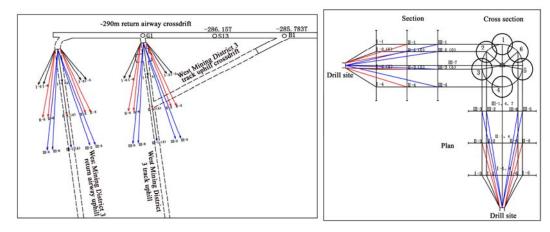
Layout plan of drill holes for advanced curtain grouting
